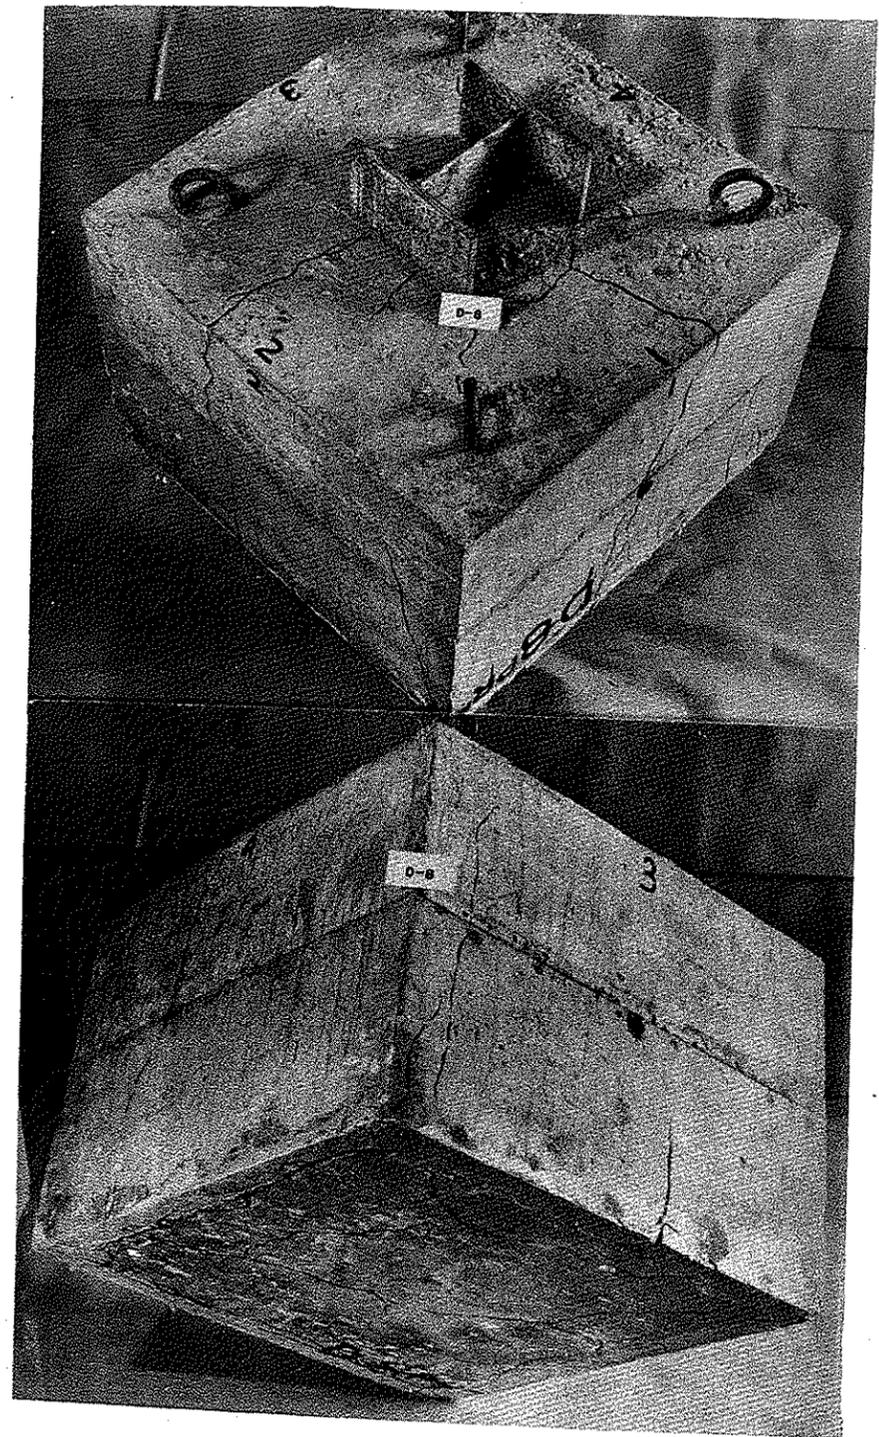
APPEARANCE OF SPECIMEN D-8 AFTER TESTING.
